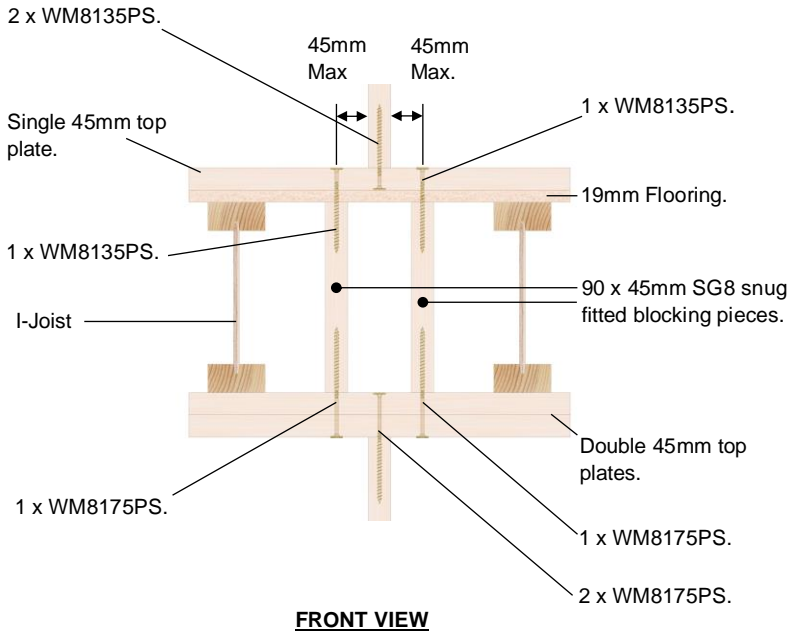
DOUBLE SCREWS WITH 90MM FRAMING
